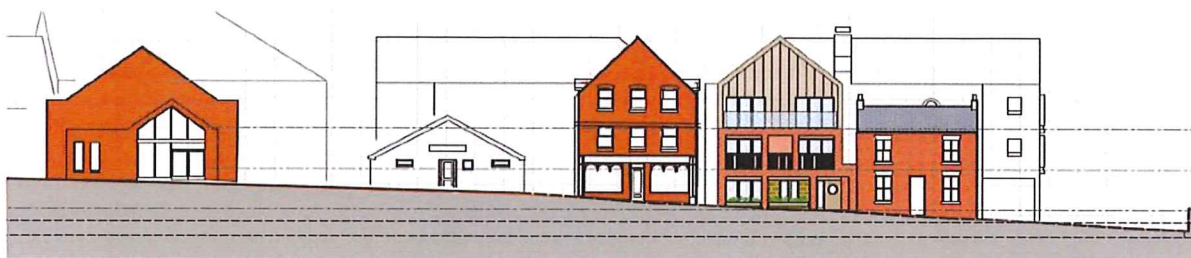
New Elevation amended to better mediate between the scale of Newmarket House and Gavel House
